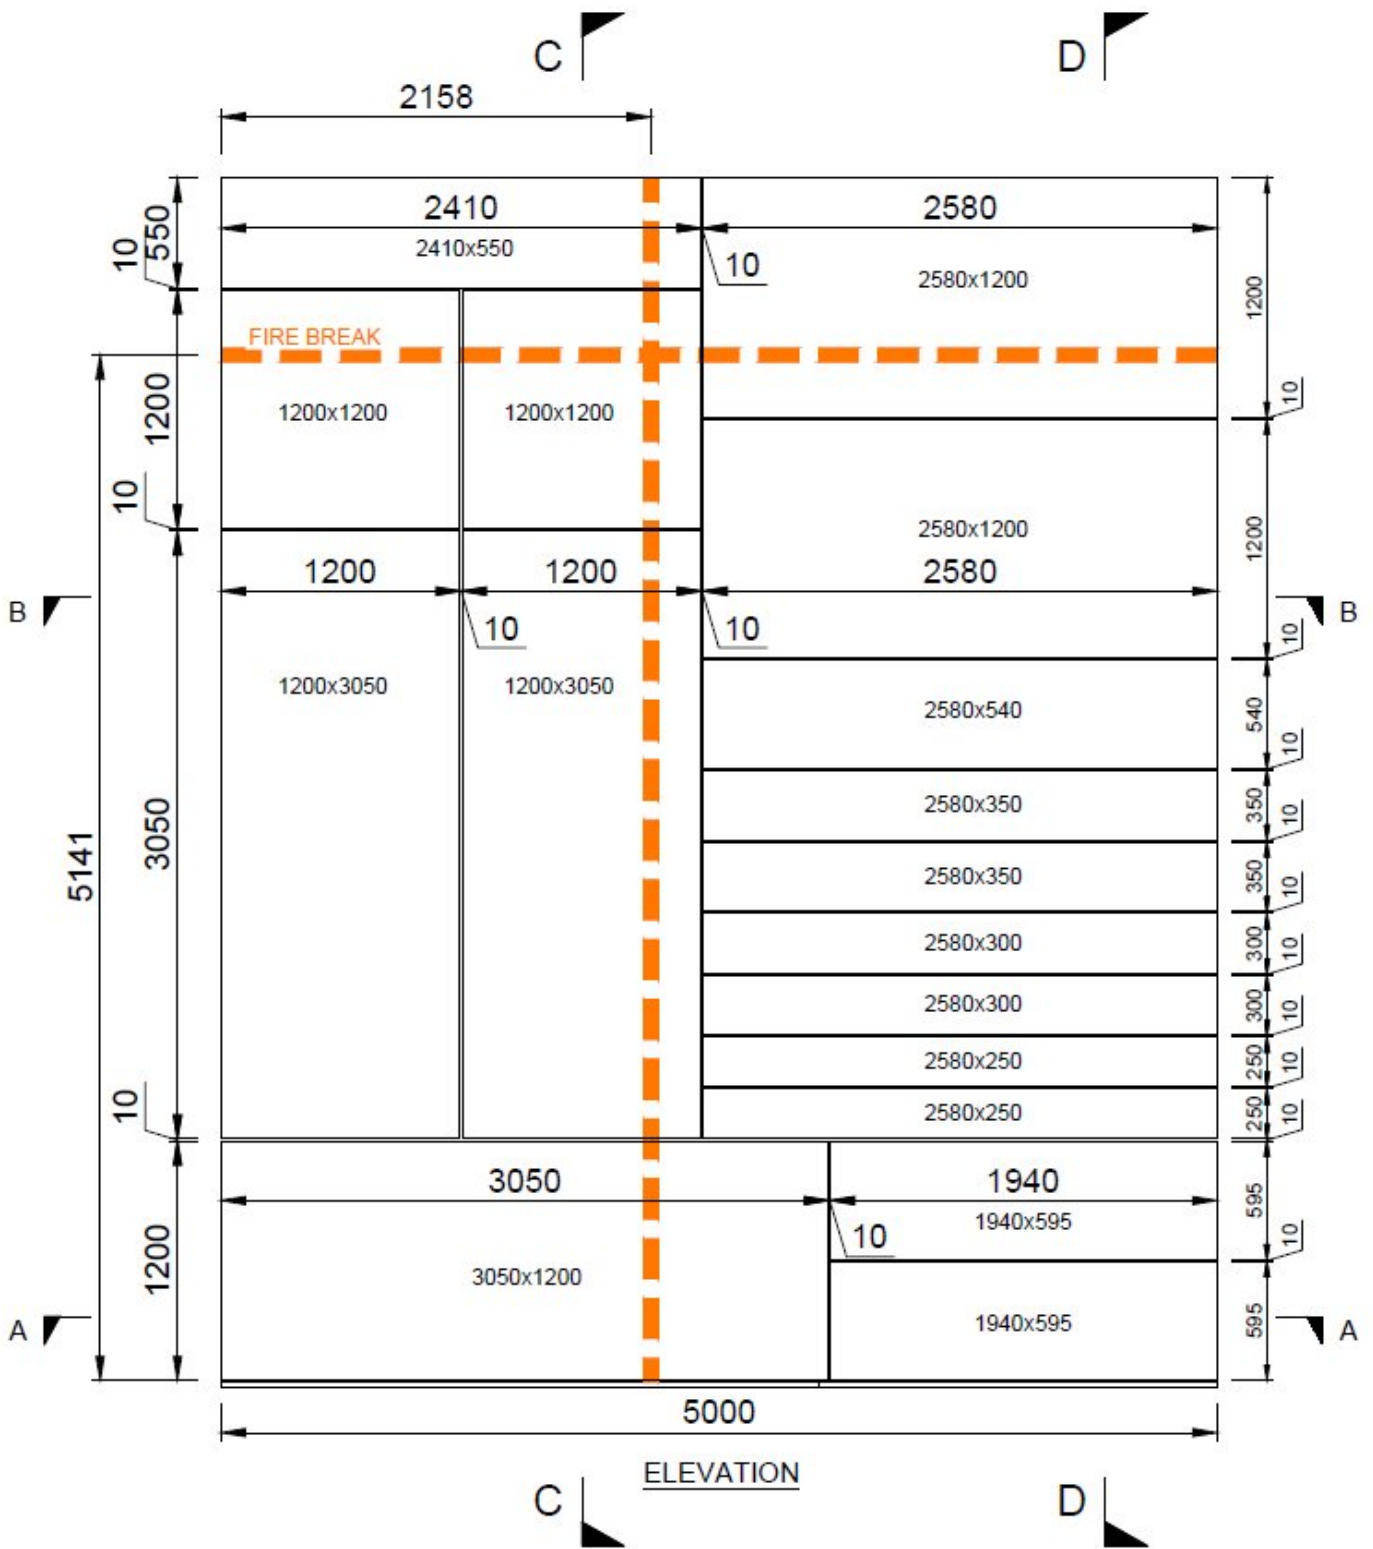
Elevation of cladding test sample showing location of cavity barriers
